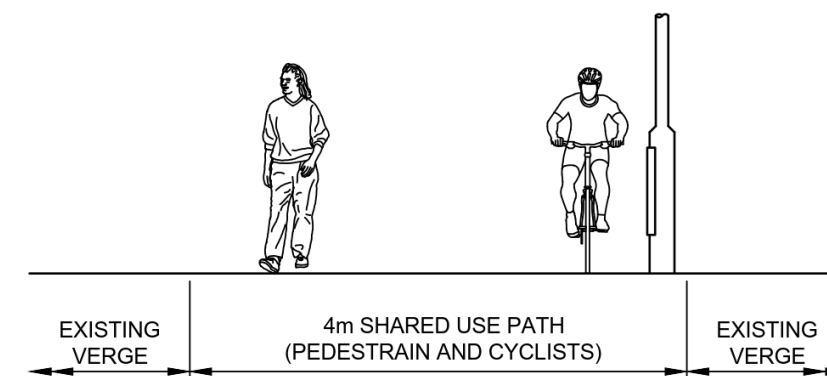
Cross Section Route 9 – Shared Use Paths through Old Craighall, Shawfair
